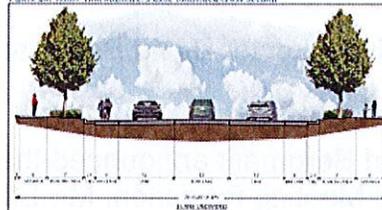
Minor Thoroughfare, 3 Lane Undivided Cross-Section
